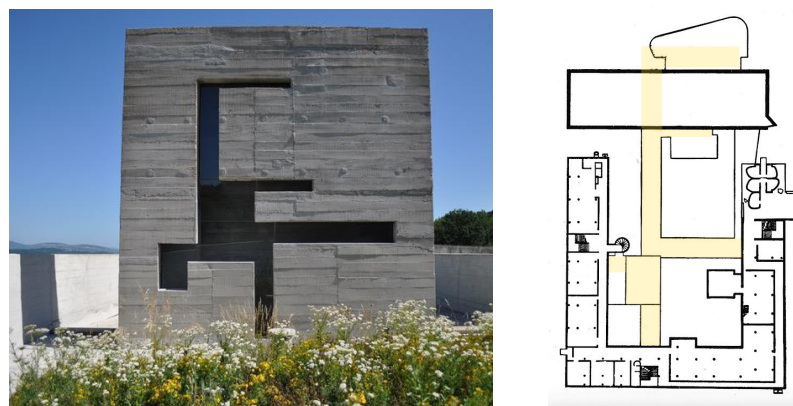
Left image: The "path of light" on the rooftop stairwell bulkhead on the terrace (*Escalier toit-terrasse, vue générale* © Famille I Xenakis DR). Right image: Light path abstract diagram on the floor plan of *La Tourette* (Plan from *wikiarquitectura*, diagram by author).
